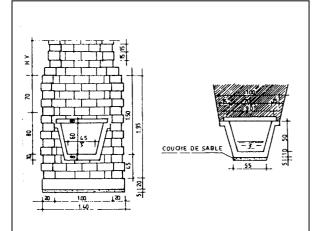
Protection of shafts with brick, masonry and gallery section with concrete (pre-fabricated)
